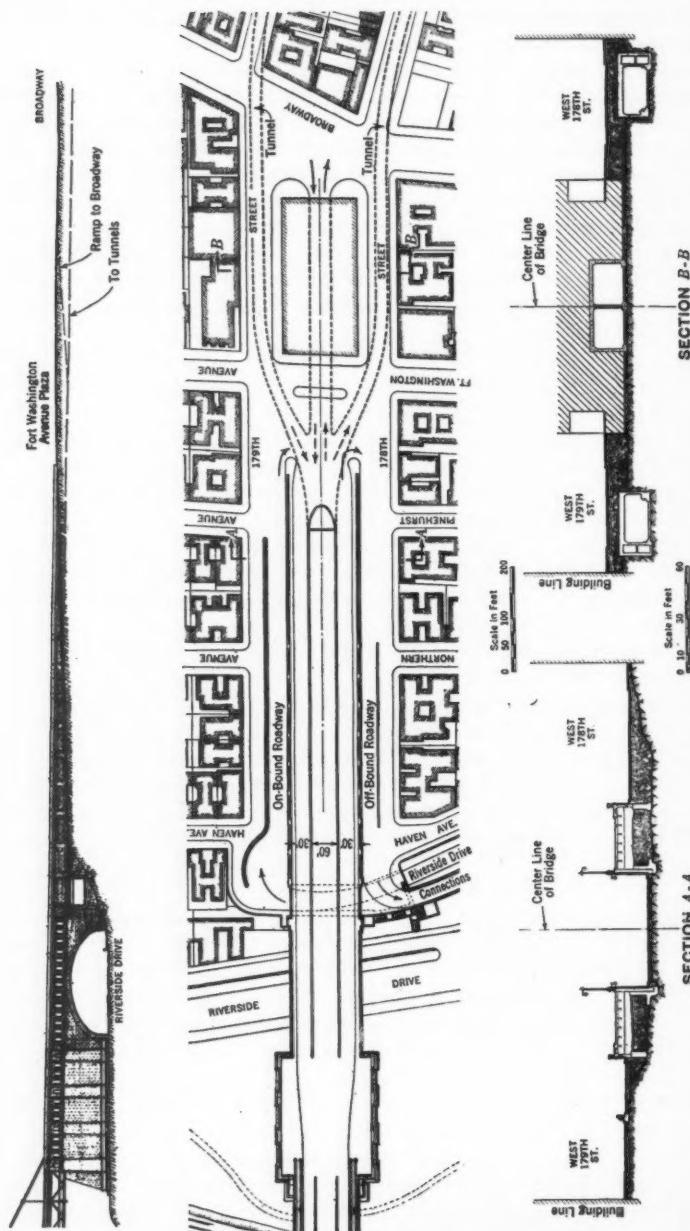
NEW YORK APPROACH, GEORGE WASHINGTON BRIDGE, ANCHORAGE TO BROADWAY, FINAL CONDITION.
